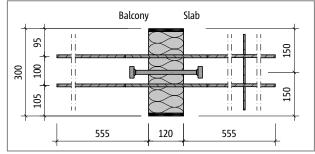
Schöck Isokorb® XT type Q-P-V1: Product plan view
